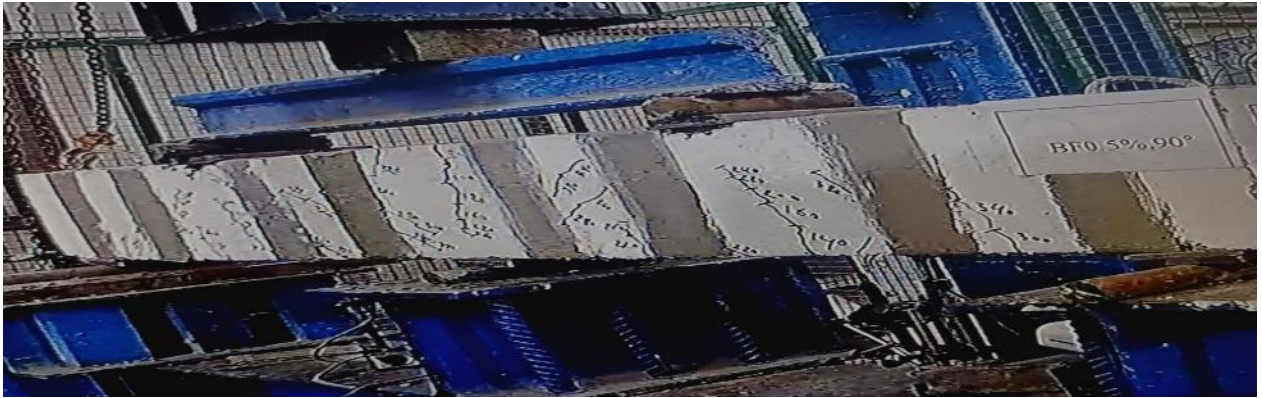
Cracks pattern after failure for (BF0.5%,90°) beam
